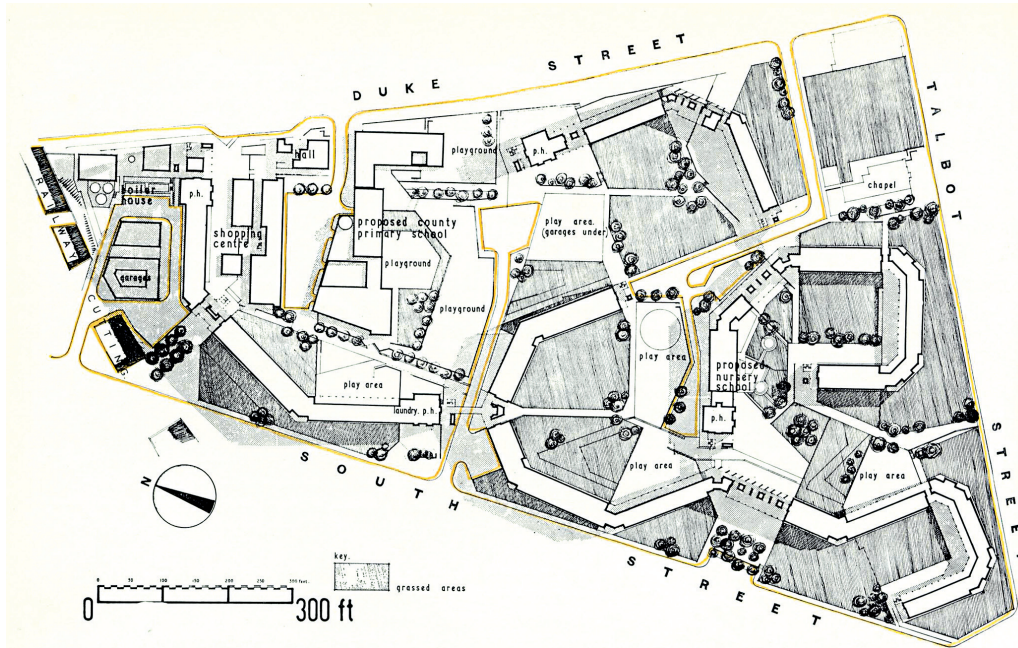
Park Hill, Sheffield, site layout from *Official Architecture and Planning*, 29, no. 2, 1966, p. 226 (Alexandrine Press)
